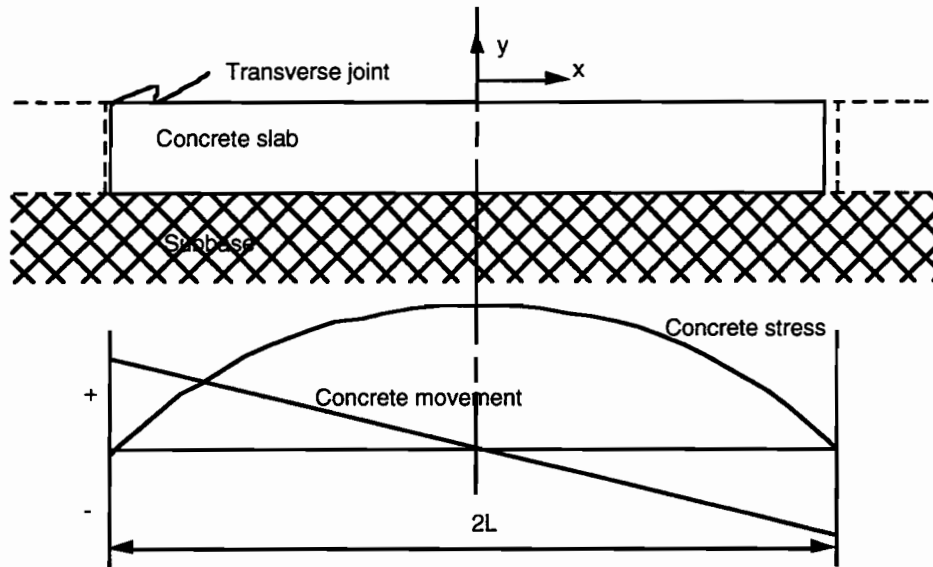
Uncracked jointed concrete pavement (JCP)
